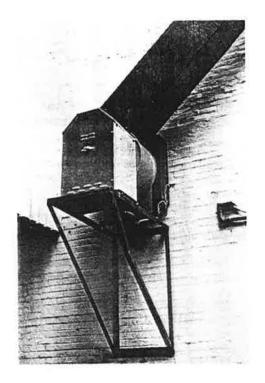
Centrifugal fan (left) and ductwork installed to minimize contamination of outdoor air intake
